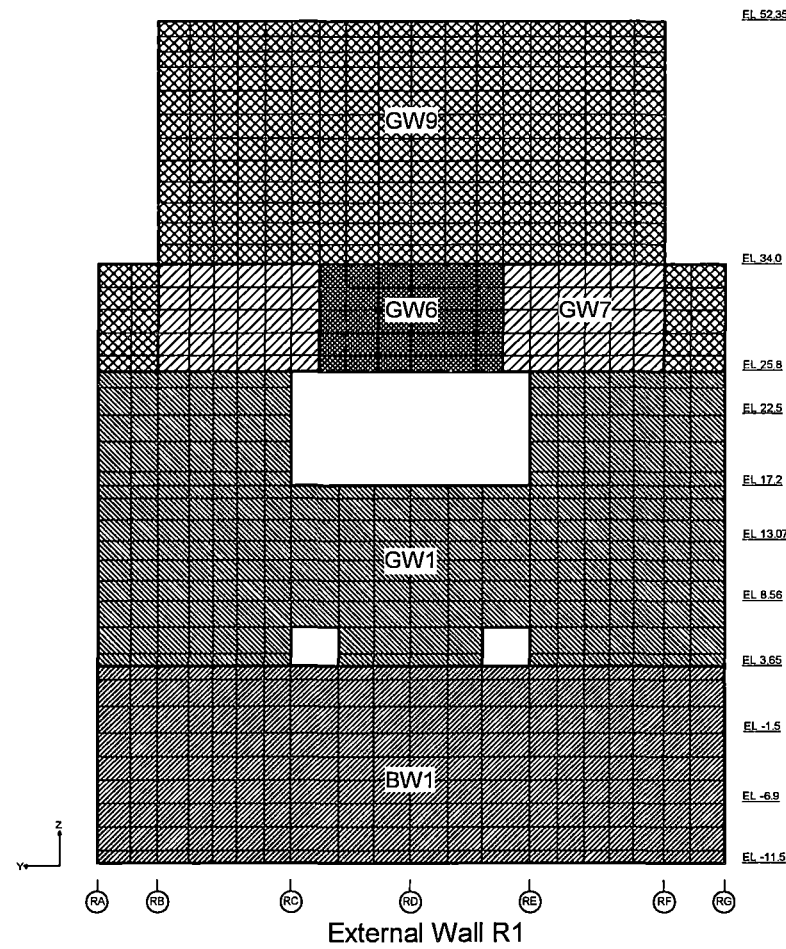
Application of Thermal Load on the External Wall (R1)
